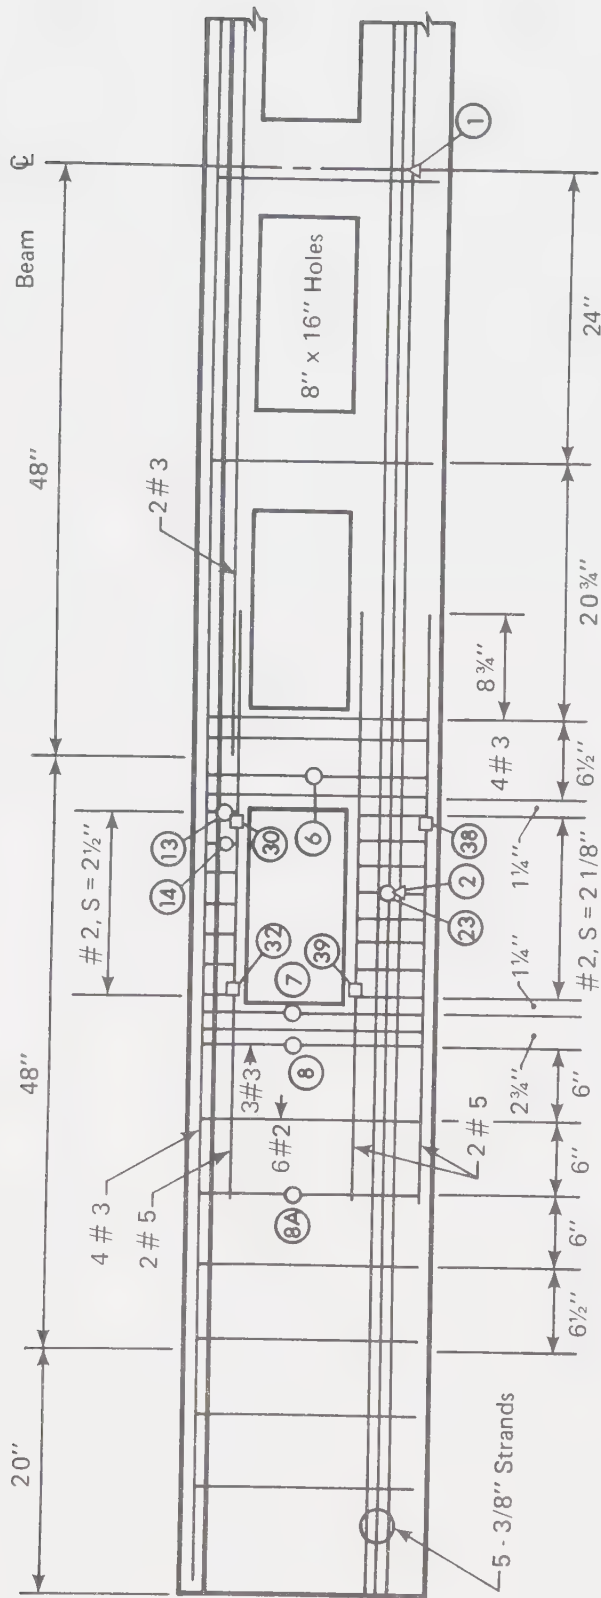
Reinforcement Details and Strain Gage Locations for Beam 28-16-4
